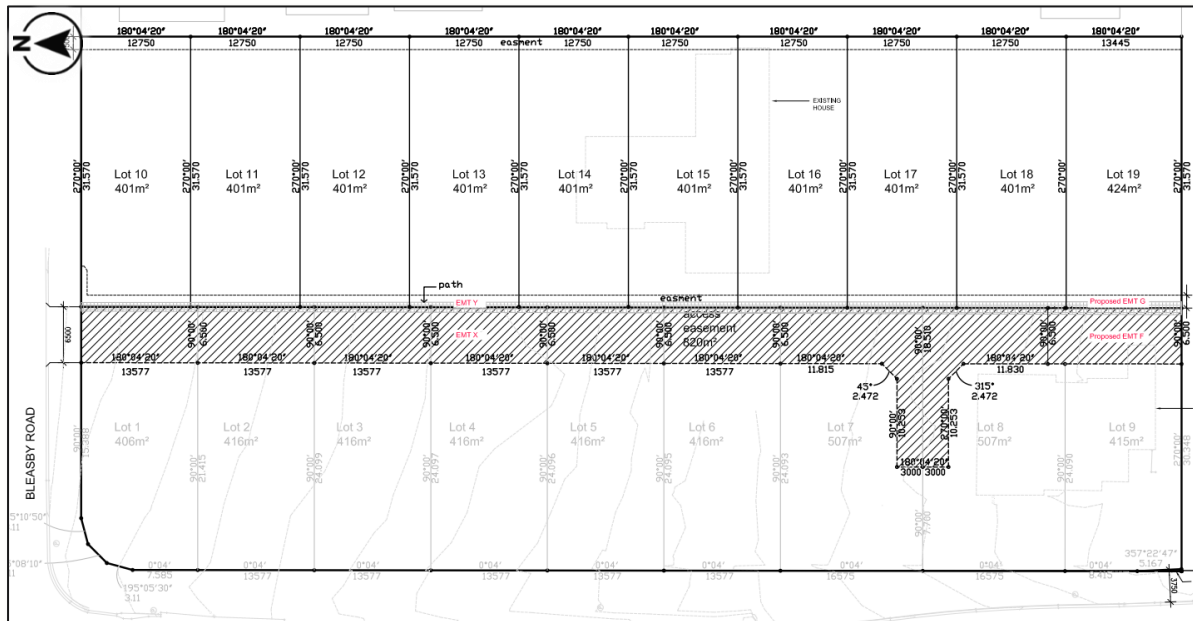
APPROVED ROL PLAN OVER 50 BLEASBY ROAD
